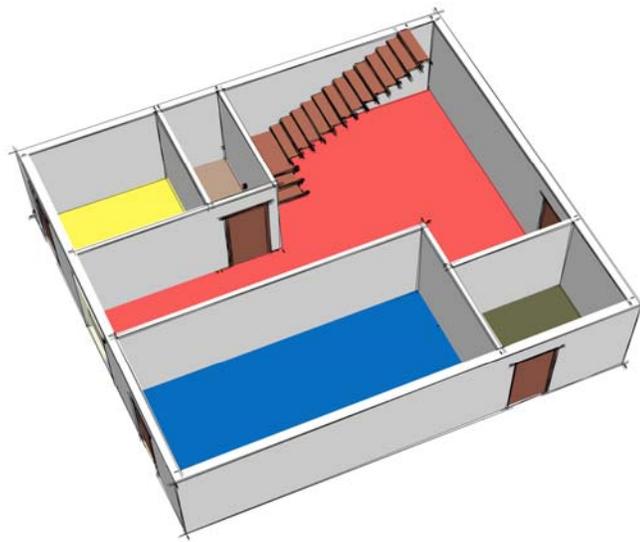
Existing Floor Plan Waste Water Treatment Plant
